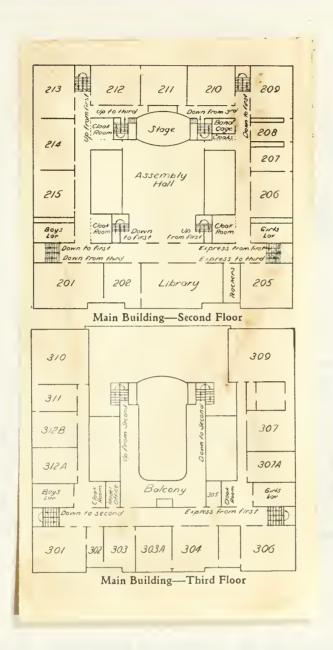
Printed floor plans from handbook of Haverhill High School (Massachusetts).
